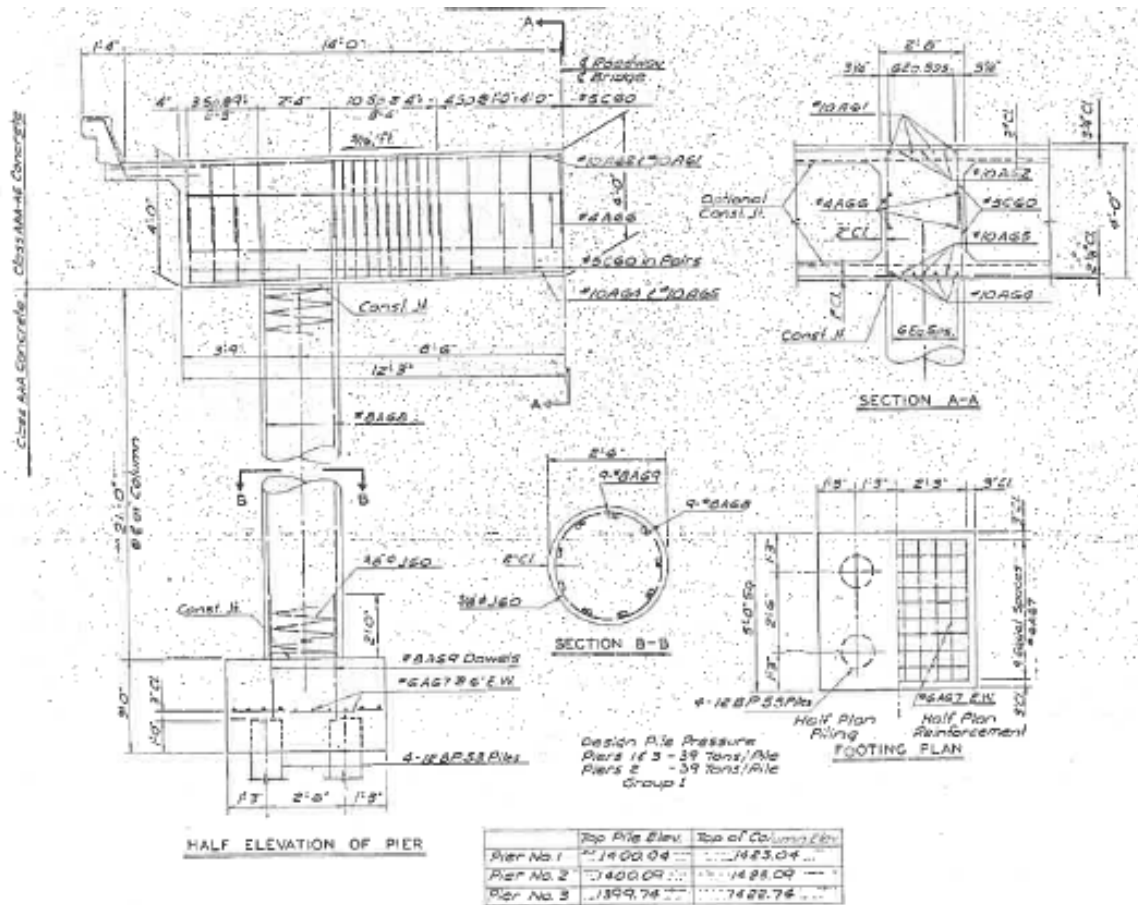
Cross Beam, Pier, and Pile Cap Dimensions, Courtesy of KDOT Bureau of Structural and Geotechnical Services
